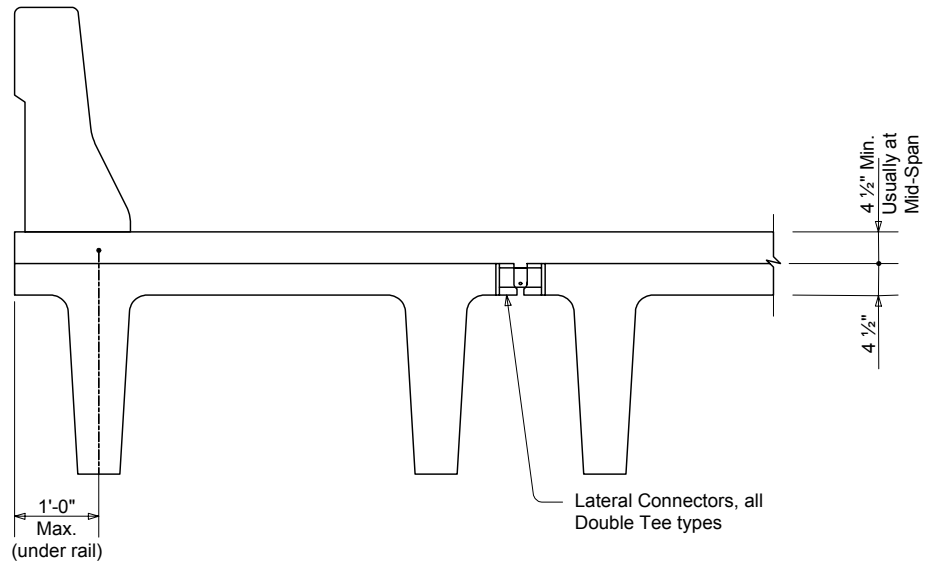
Prestressed Double Tee Beam Typical Section
